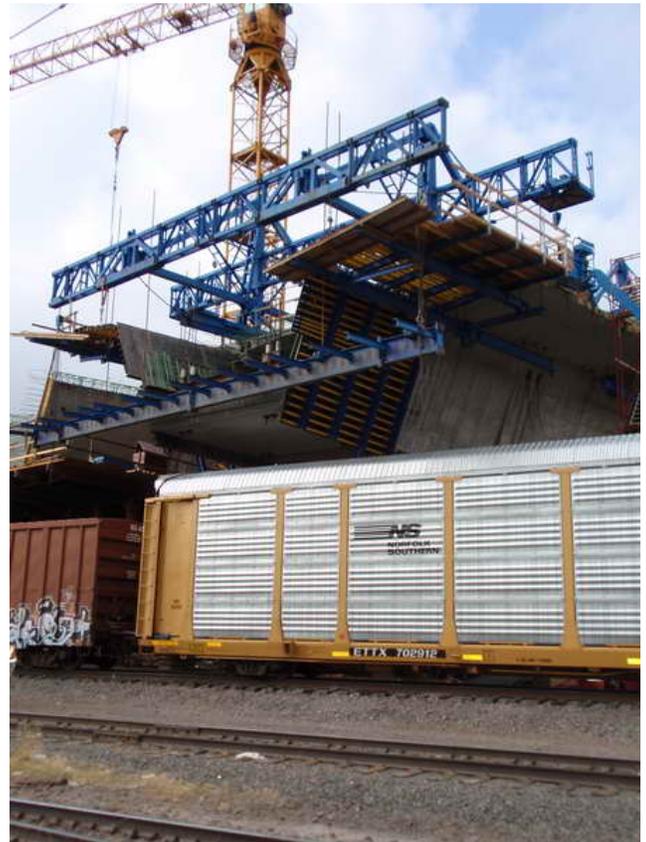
Cantilever 4 WB Segmental Construction – August 15, 2009:
